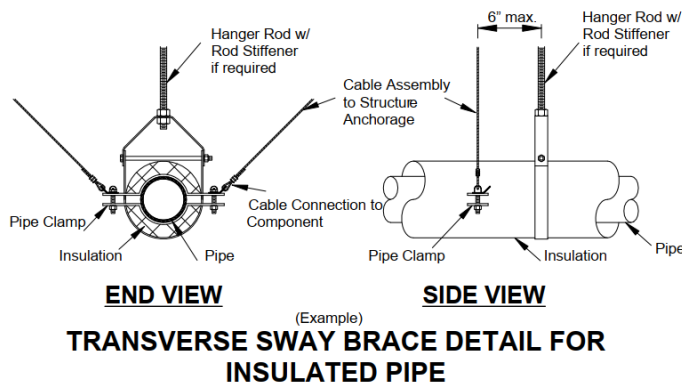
SWAY BRACE DETAILS FOR INSULATED PIPE AND CONDUIT
